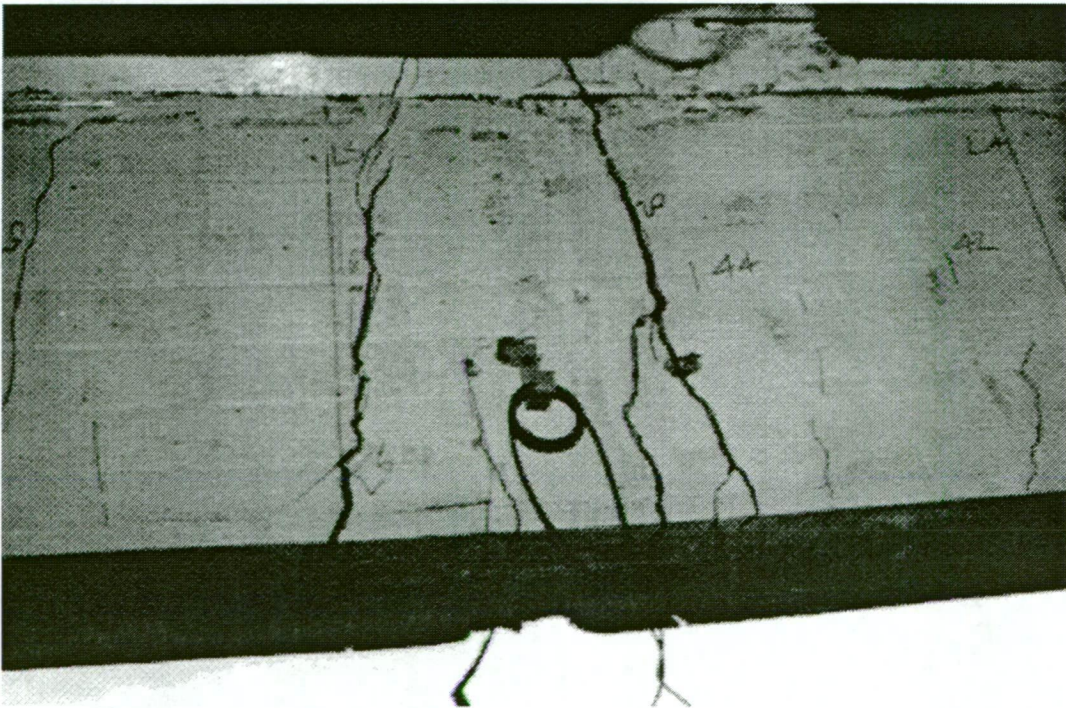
Cracking of Downstream Beam at Ultimate Load
